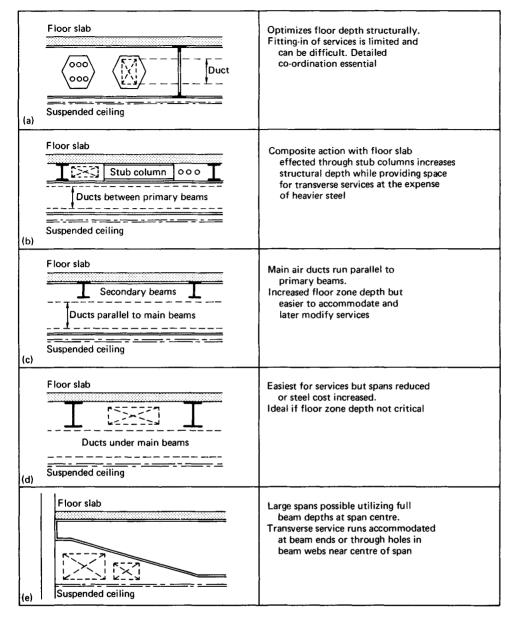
Floor slabs may be *in situ* or precast concrete and are frequently designed to act compositely with the beams. Profiled steel decking with through-welded stud shear connectors supporting an *in situ* lightweight or normal concrete topping can provide a fast and practical composite floor construction. (a) Castellated deep beams; (b) shallow beams with stub columns; (c) deep primary beams at close centres; (e) tapered beams
